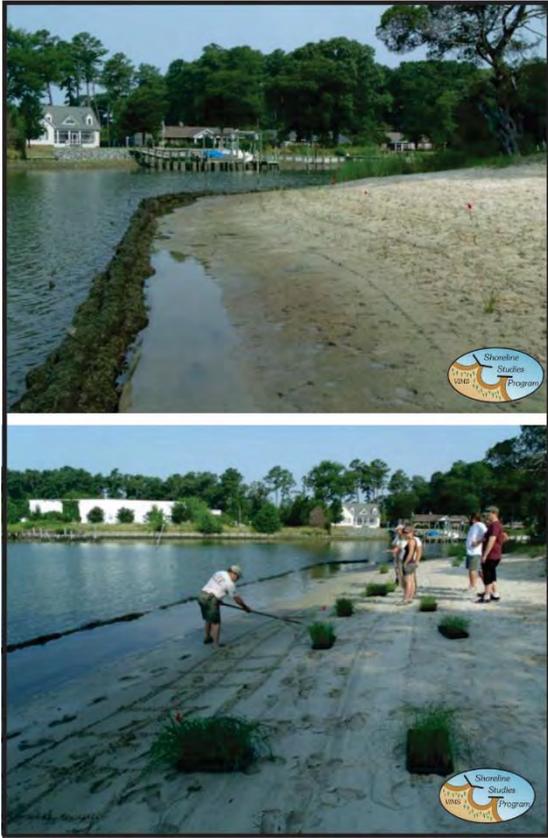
Post bag and sand installation at Site 1. The sand fill is visible landward of the sill, and volunteers planted grasses on the fill. Photo credit: Walter Priest, 29 June 2011.
